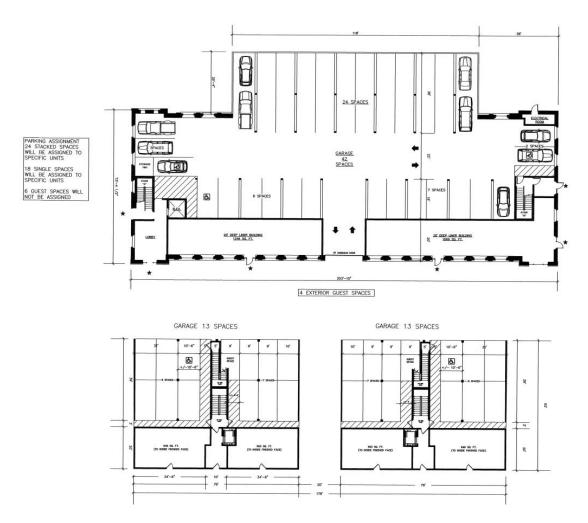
Proposed Parking Layout (72 Spaces) for the Design Review Plan
